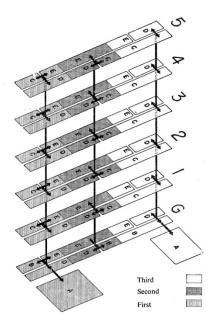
Future expansion of new colleges: to be sideways, not vertical [Source: Building Bulletin No.5, August 1951. [H.M.S.O.] Diagram 8, p.38.]
